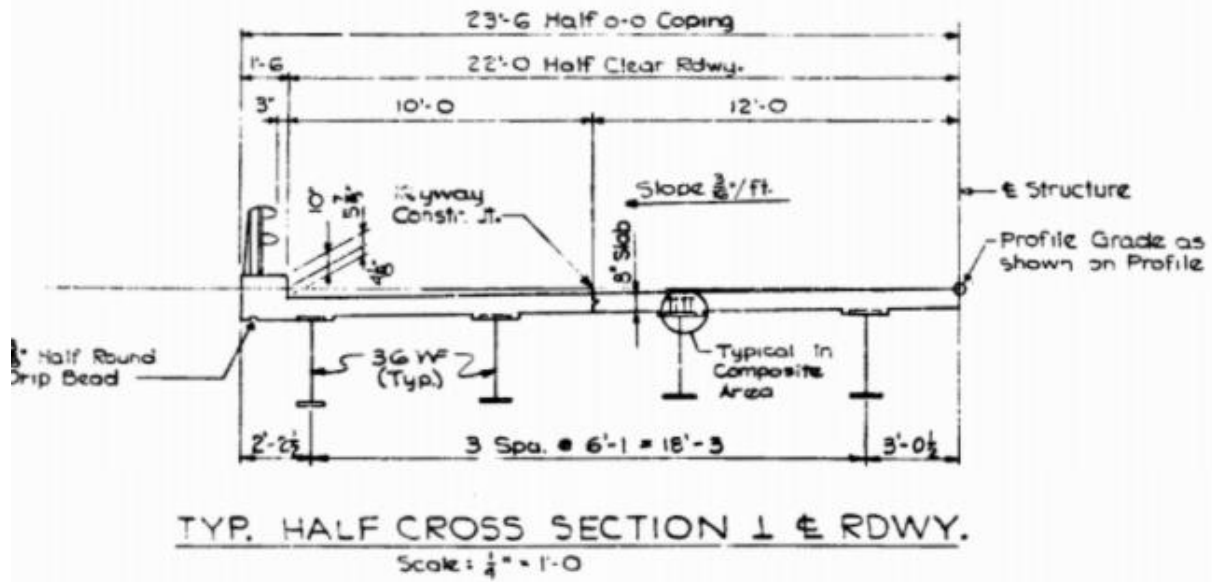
Typical Section of the Bridge (NBI 24210) (1971)
